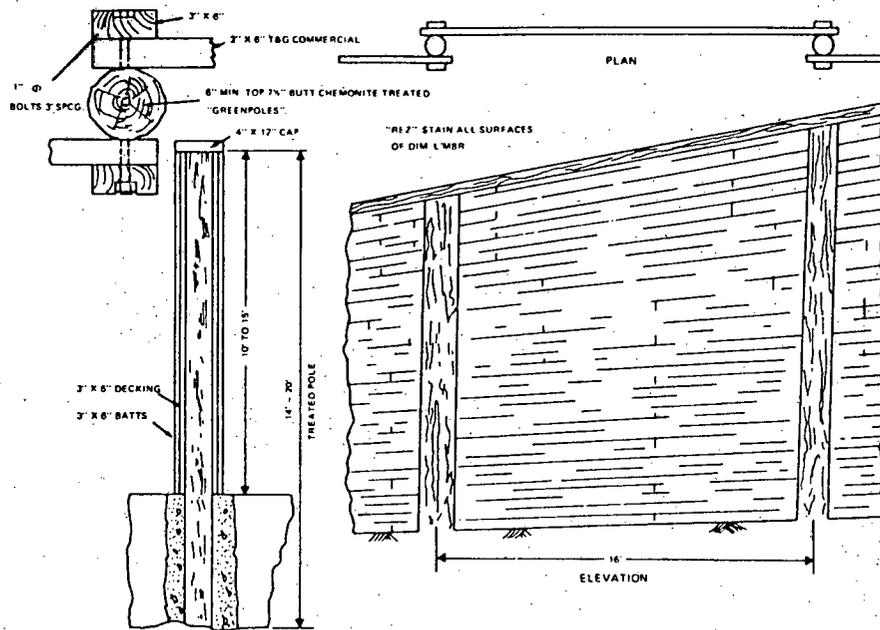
OREGON TIMBER WALL NOISE BARRIER I-205, PORTLAND
